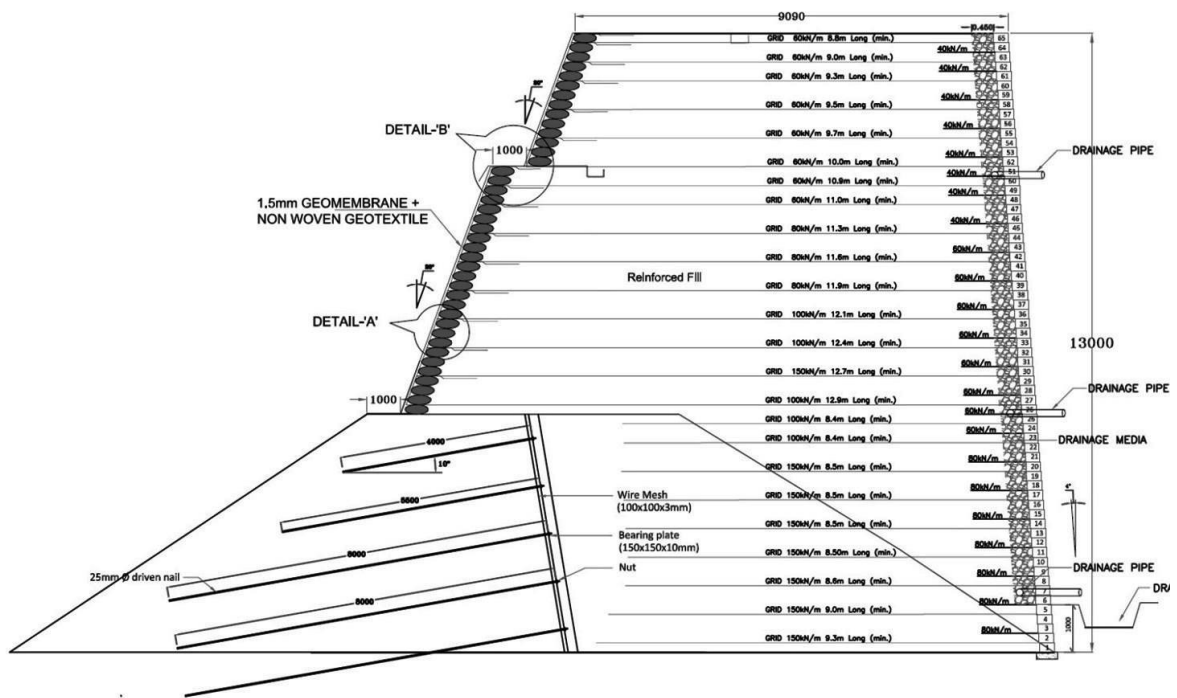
(a) East Side cross section. With West direction to left: Design of soil nails for exposed excavation
